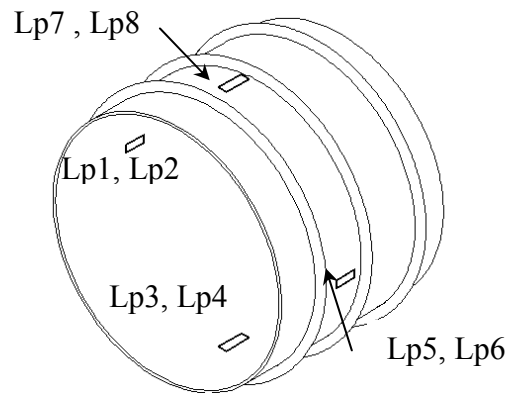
Pipe Wall Section and Strain Gauge Orientation
